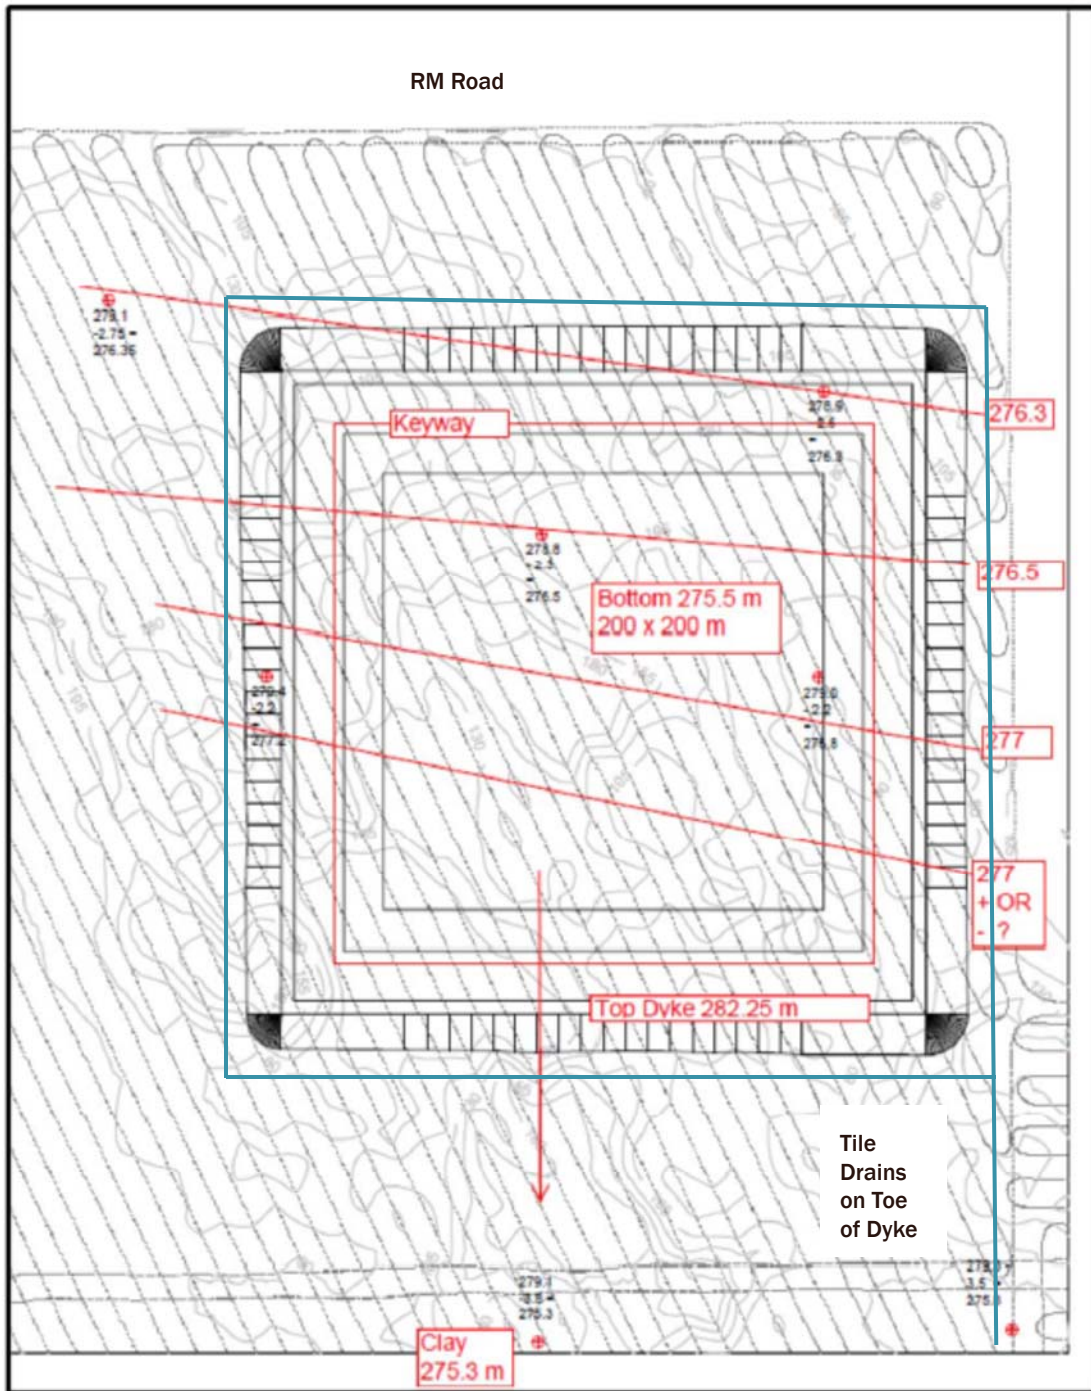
Preliminary Reservoir Layout c/w Test Holes and Elevation Clay (Interpolate)
